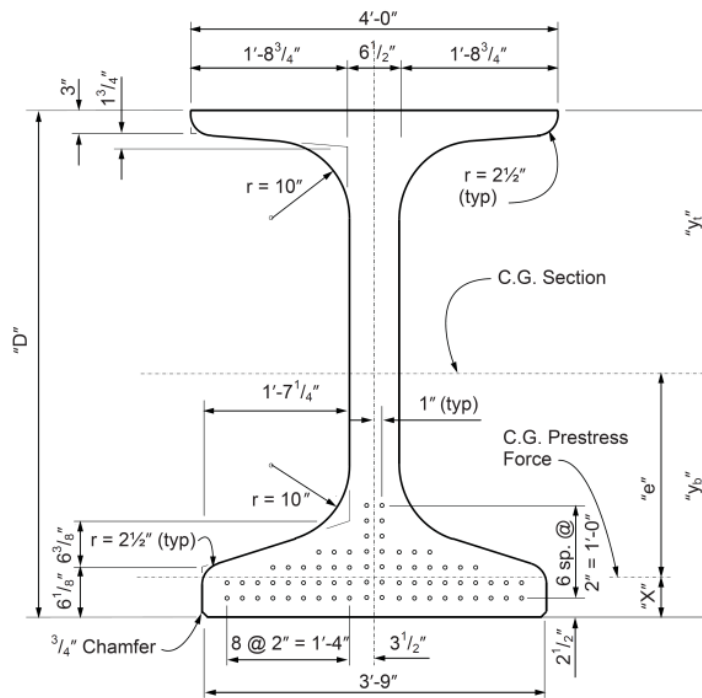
Example PC Girder Sections (BDM 5.3)
